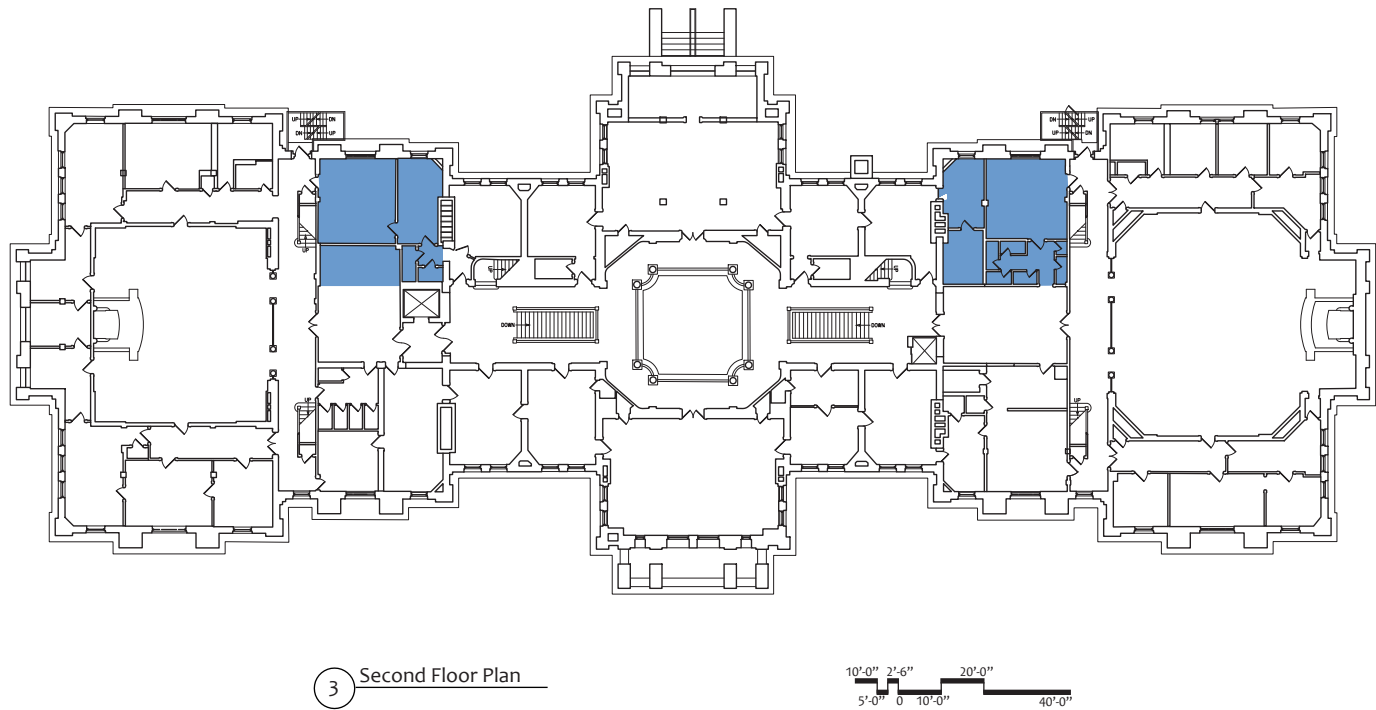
Second Floor Plan of Service Cores [highlighted in dark blue]
